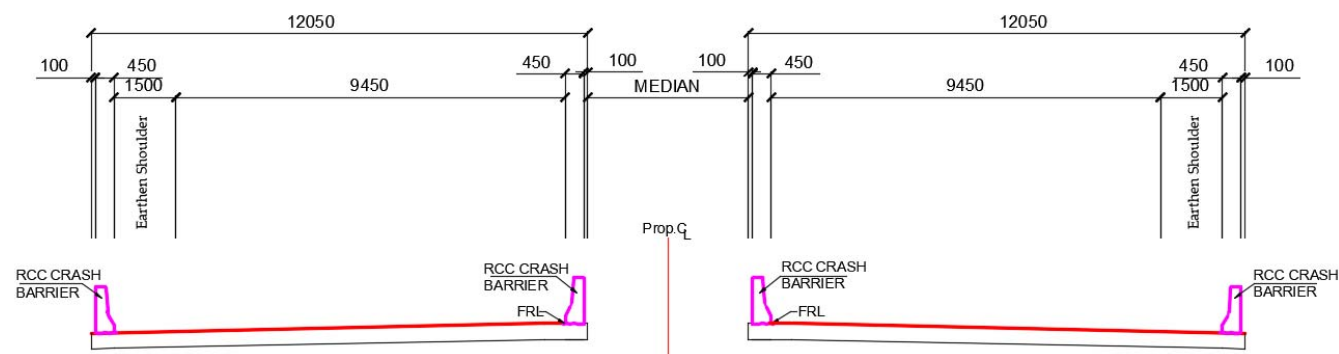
4-Lane Slab/ Box Culvert at Road Level (TCS-15)
